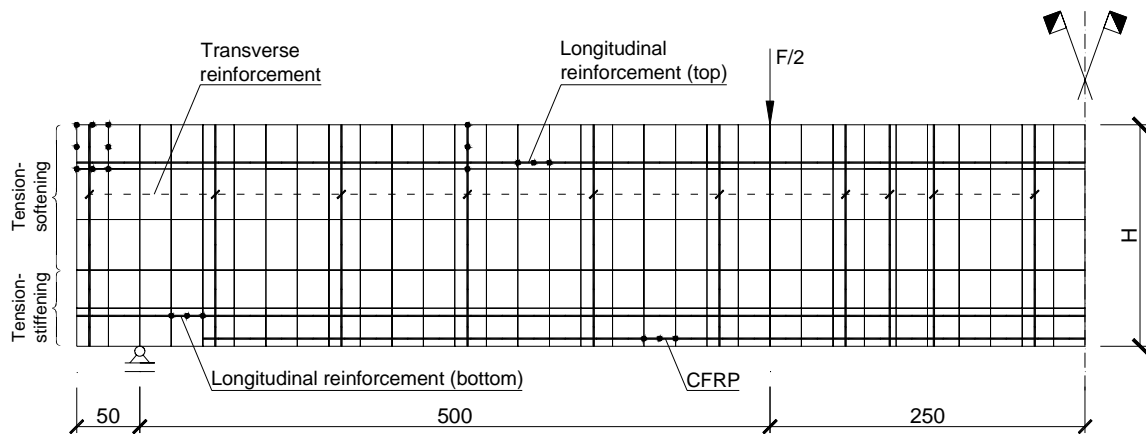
Geometry, mesh, loading and support conditions of reinforced concrete beams strengthened with CFRP laminate strips. Perfect bond between the CFRP and concrete is assumed. Note: all dimensions are in millimeters.
